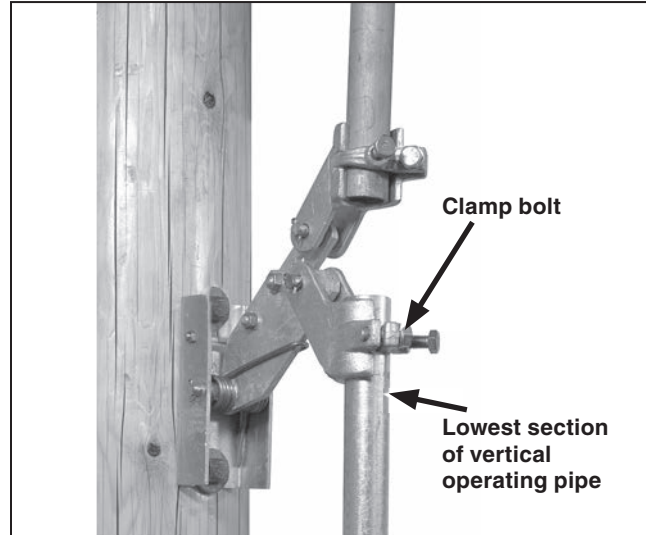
Installing the lowest operating pipe section into the rod guide (or interphase drive lever) coupling.
